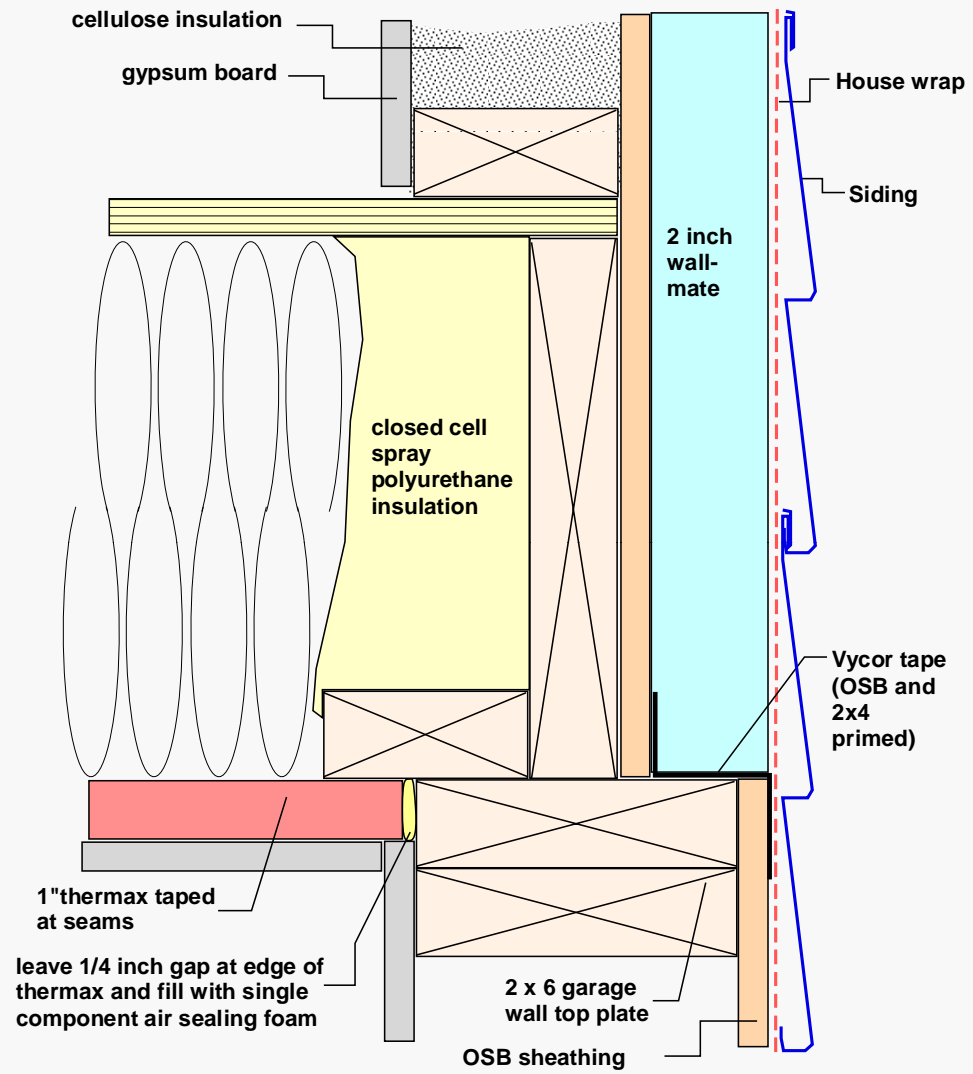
Intersection between garage exterior wall, bonus room gable end wall and floor between bonus room and garage.
